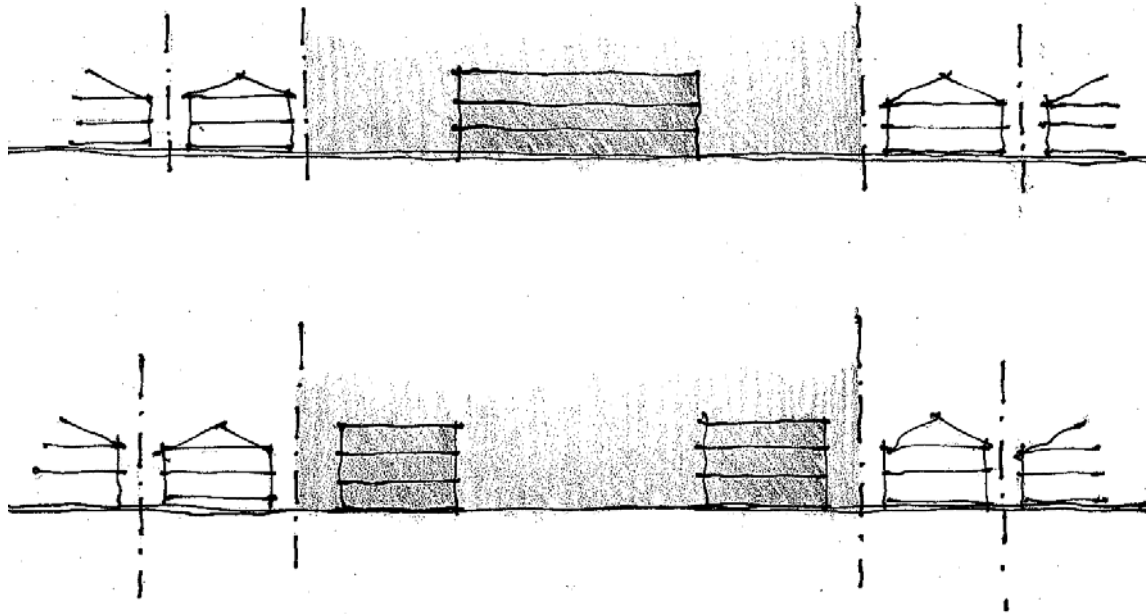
Campuses generally consist of a collection of buildings so they require different setback controls to residential buildings. The top drawing indicates a building location which results from setbacks that treat the campus as a single building and push the recreation space to the periphery of the site where it impacts in surrounding residences. The lower diagram shows the result of setbacks which recognise that the campus consists of a collection of buildings and allow the buildings to shield the recreation space from surrounding residences.
